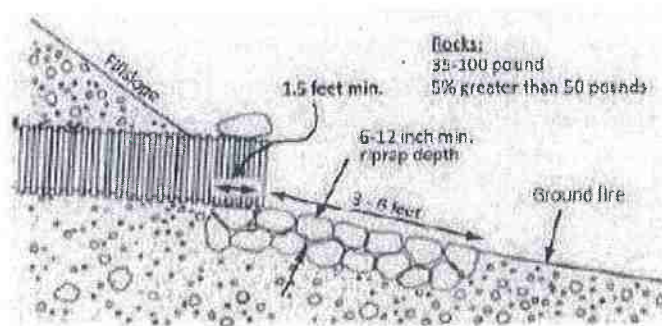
A. Riprap armor at culvert outlet (Modified from: Keller et al., 2011).
